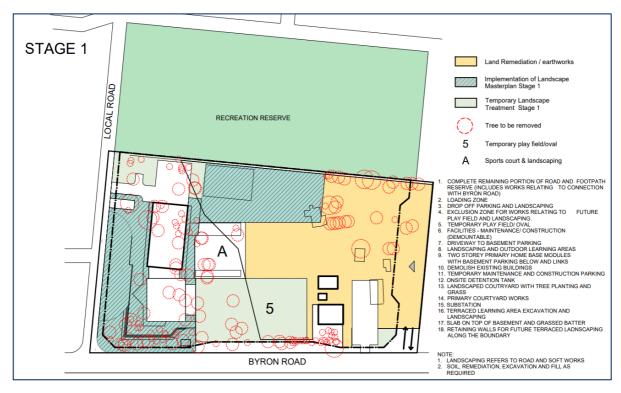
| Stage 1 landscape plan – as proposed to be modified (Source: Applicant's Modification Report)
